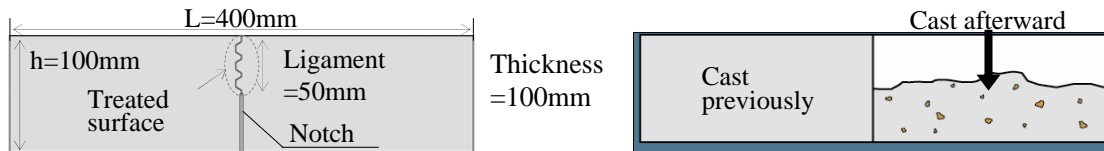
Detail of specimen (left) and method for producing specimen (right).
